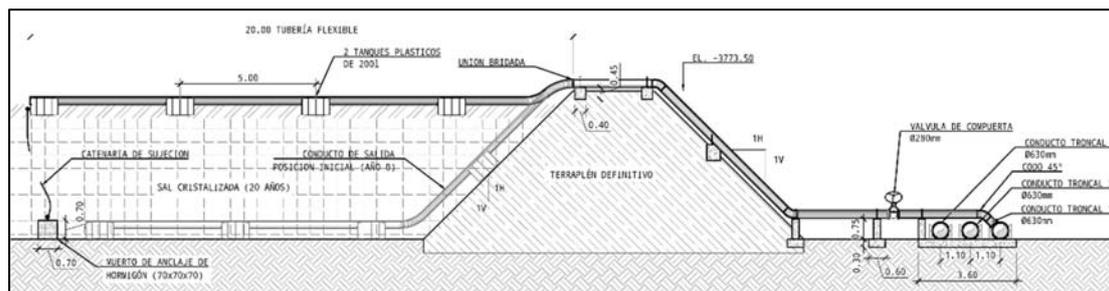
Typical cross-section of the starter embankment on the disposal spine side of a facility.
